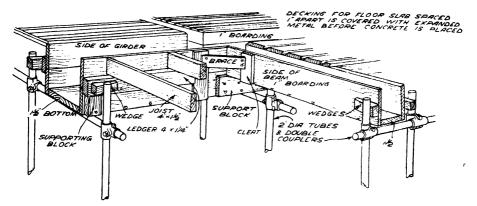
Formwork at junction of girder and beam at c in fig. 1
